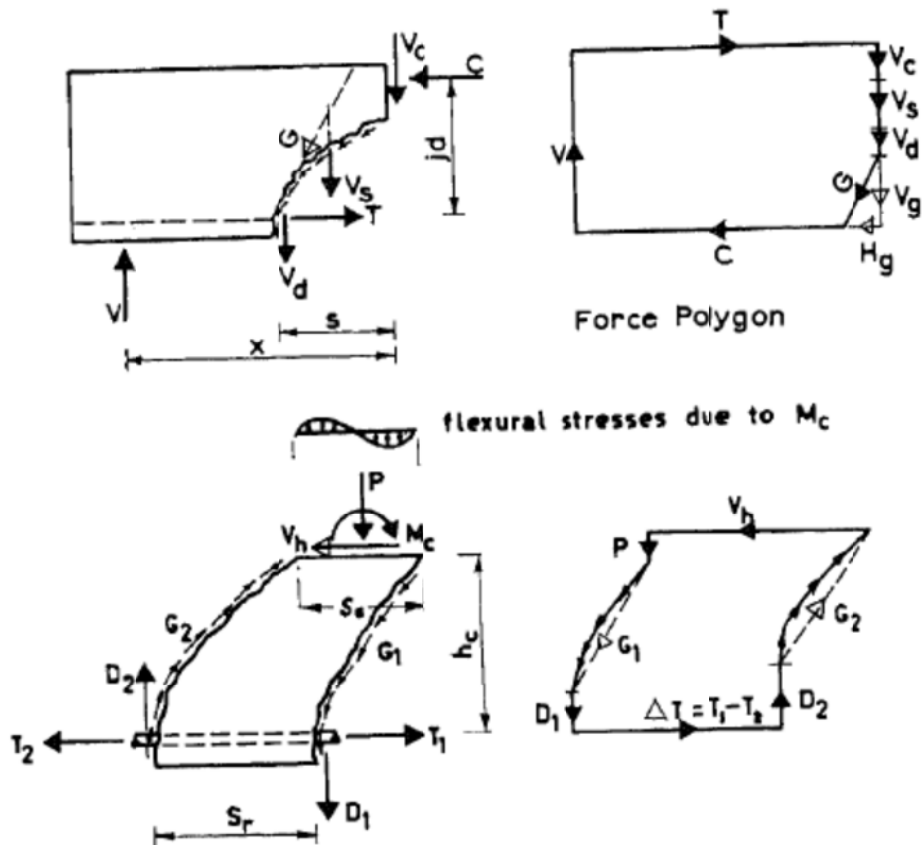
Forces acting in shear span of a beam. (Fenwick and Paulay, 1968).
